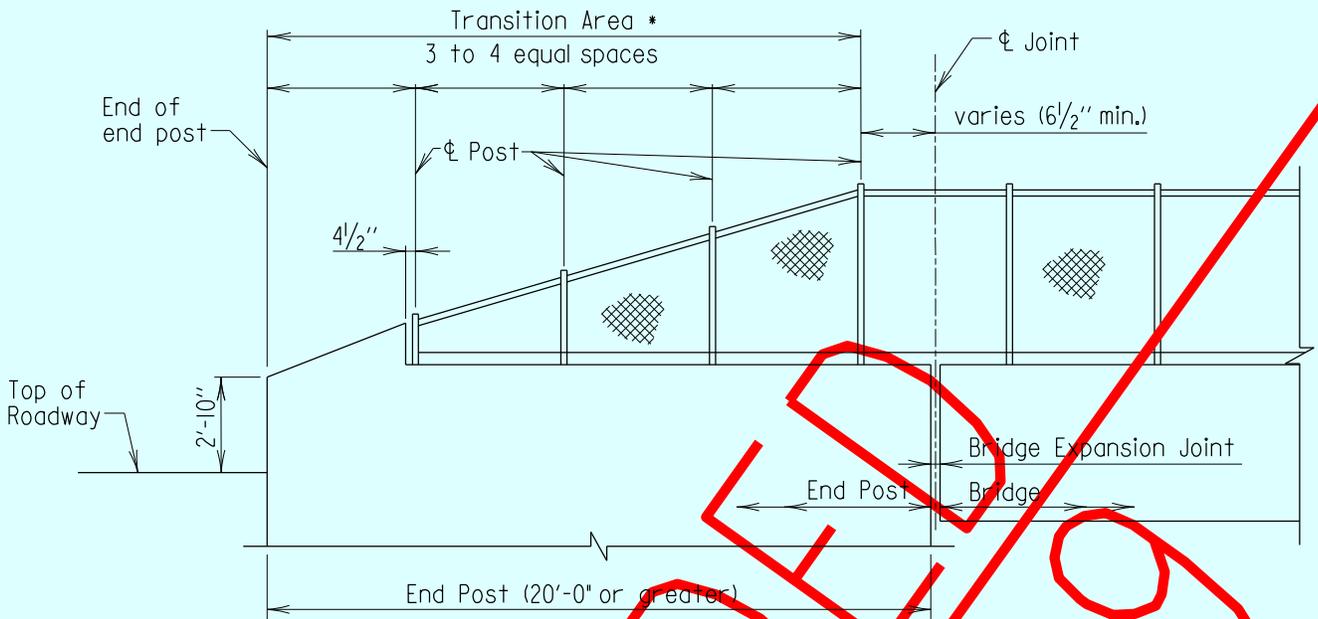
DETAIL NO. SUP-FR(FN)-101 RESCINDED
